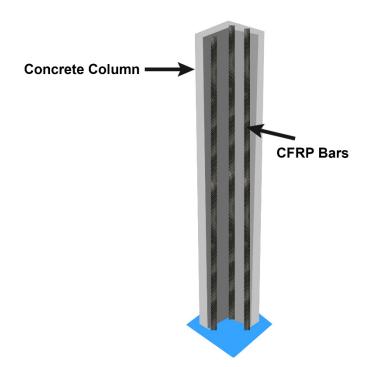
Enhancing strength and durability of concrete columns through CFRP reinforcement for increased load-carrying capacity and resistance to external forces.
